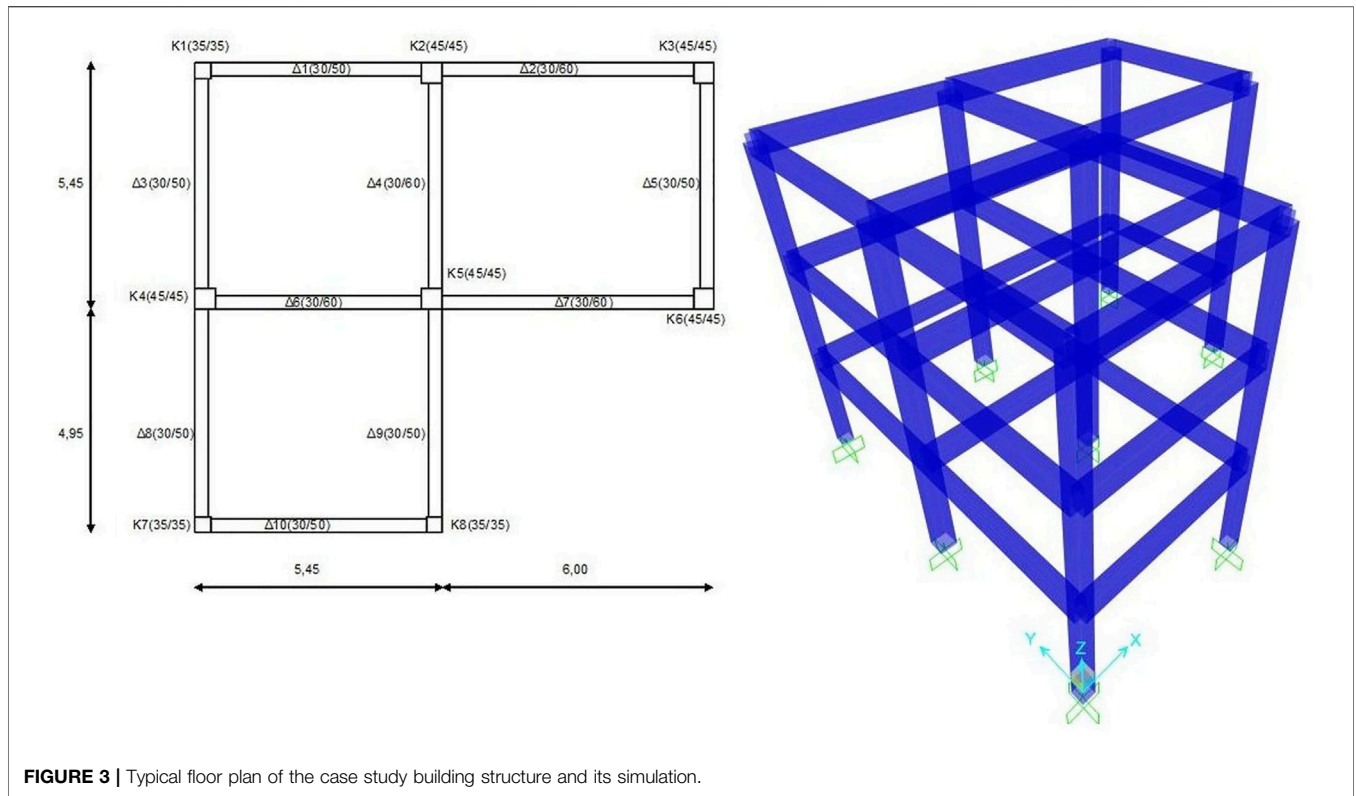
| Typical floor plan of the case study building structure and its simulation.
